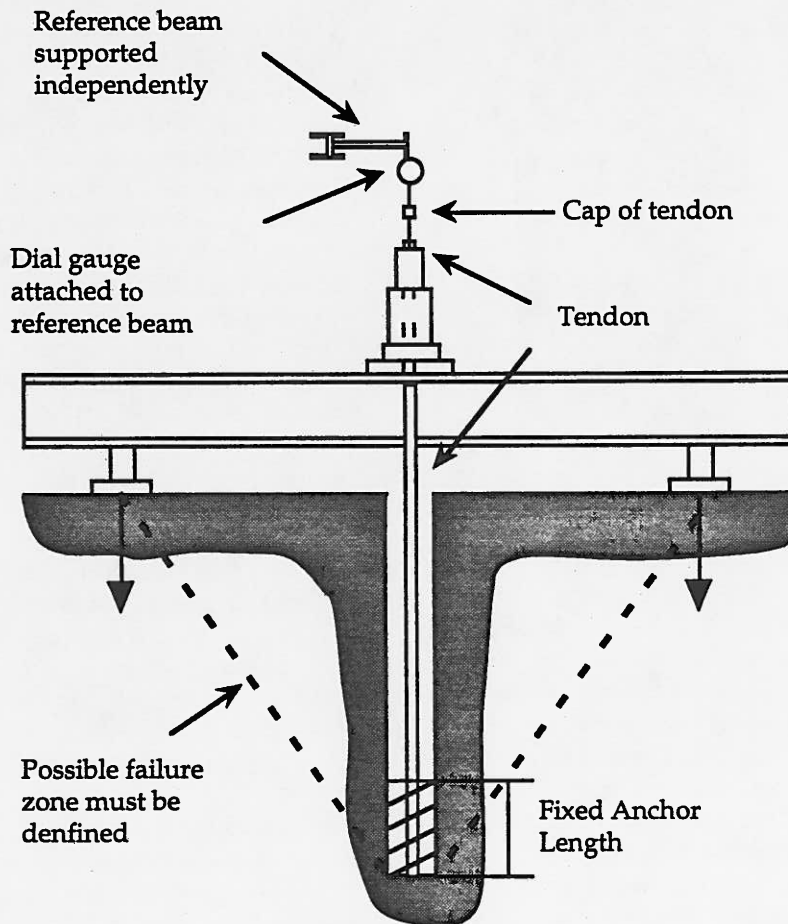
Remote loading of an anchorage (after Littlejohn, 1992 after ISRM, 1985)
